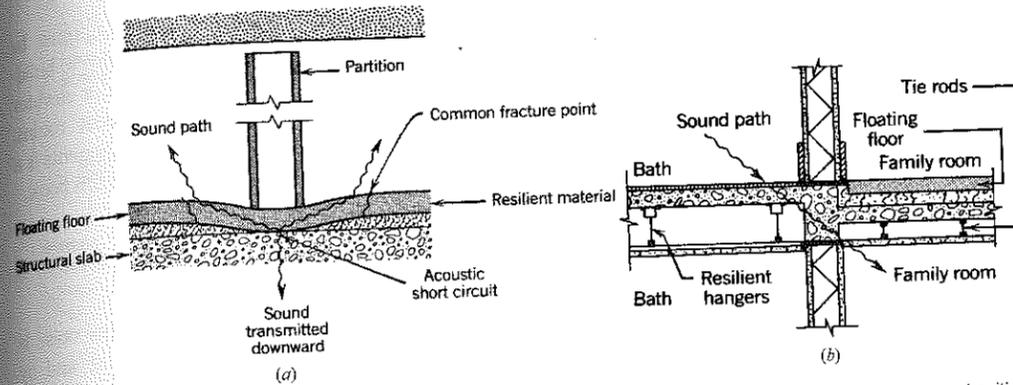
(a) Caution must be exercised when supporting partitions on floating floors to prevent structural failures or short-circuiting of the floating element, as illustrated. (b) Flanking paths in mixed-construction type floors. The FHA does not recommend mixing construction types unless provisions have been made to prevent flanking (e.g., expansion joints or breaks in all structural paths between each space). (Reprinted from *A Guide to Airborne, Impact, and Structure-Borne Noise Control in Multifamily Dwellings*, 1968.)
